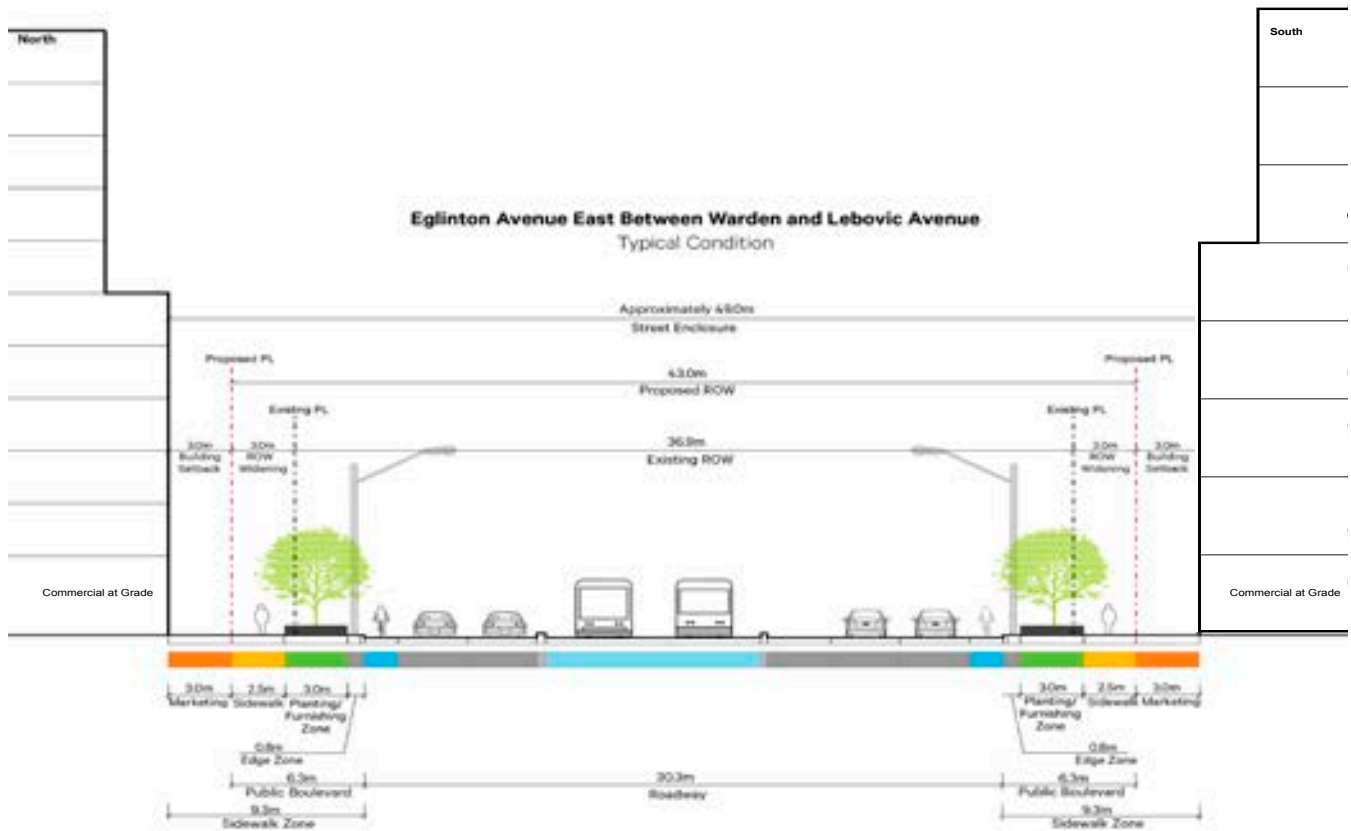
Conceptual Cross-section of Widened Eglinton Avenue East (43m ROW)
